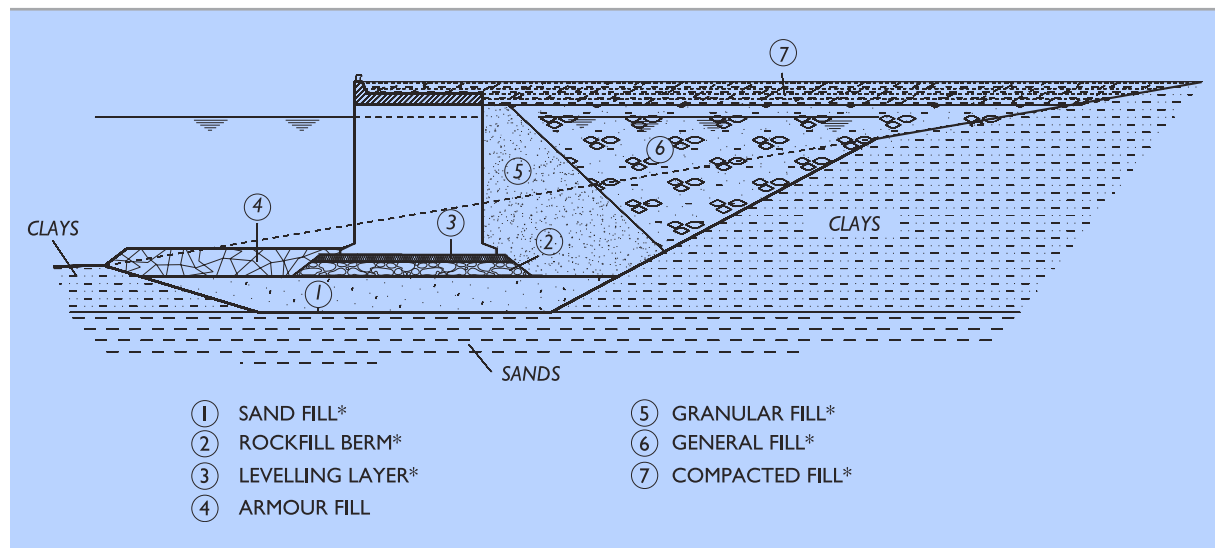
shows a simplified typical quay section with some common fill zones.
